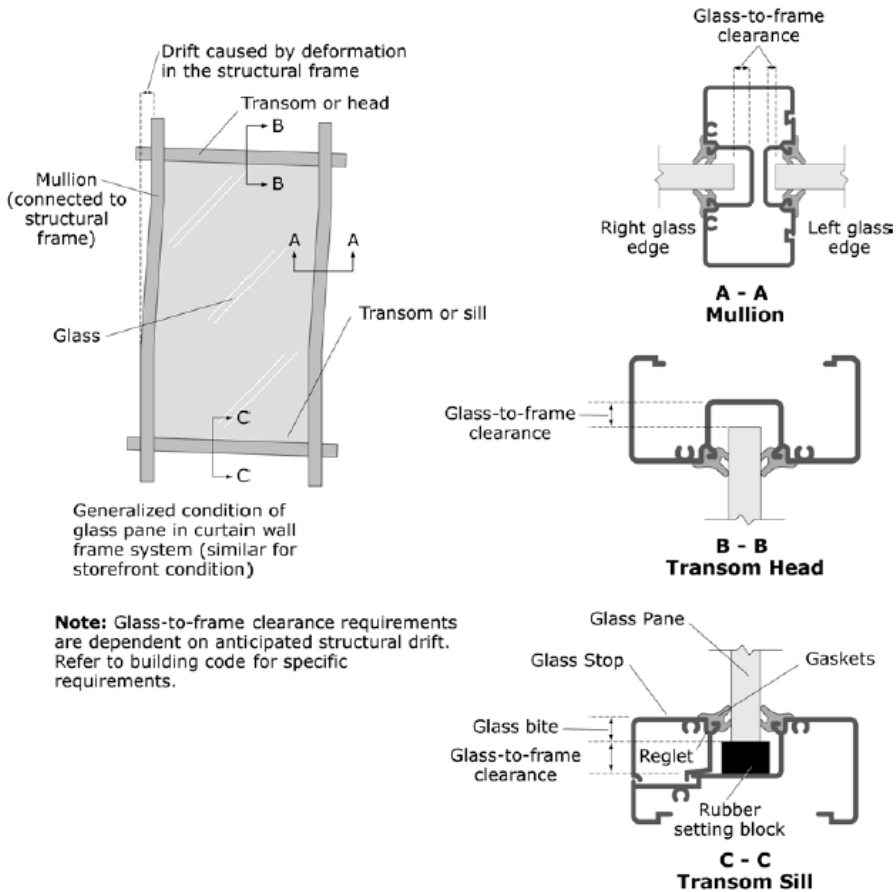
Glazed exterior wall system (FEMA 74, 2011)
